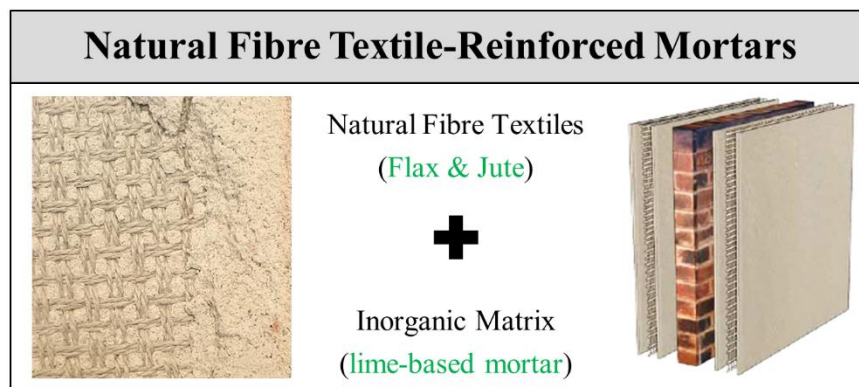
Overview of the proposed externally bonded NTRM strengthening system.
